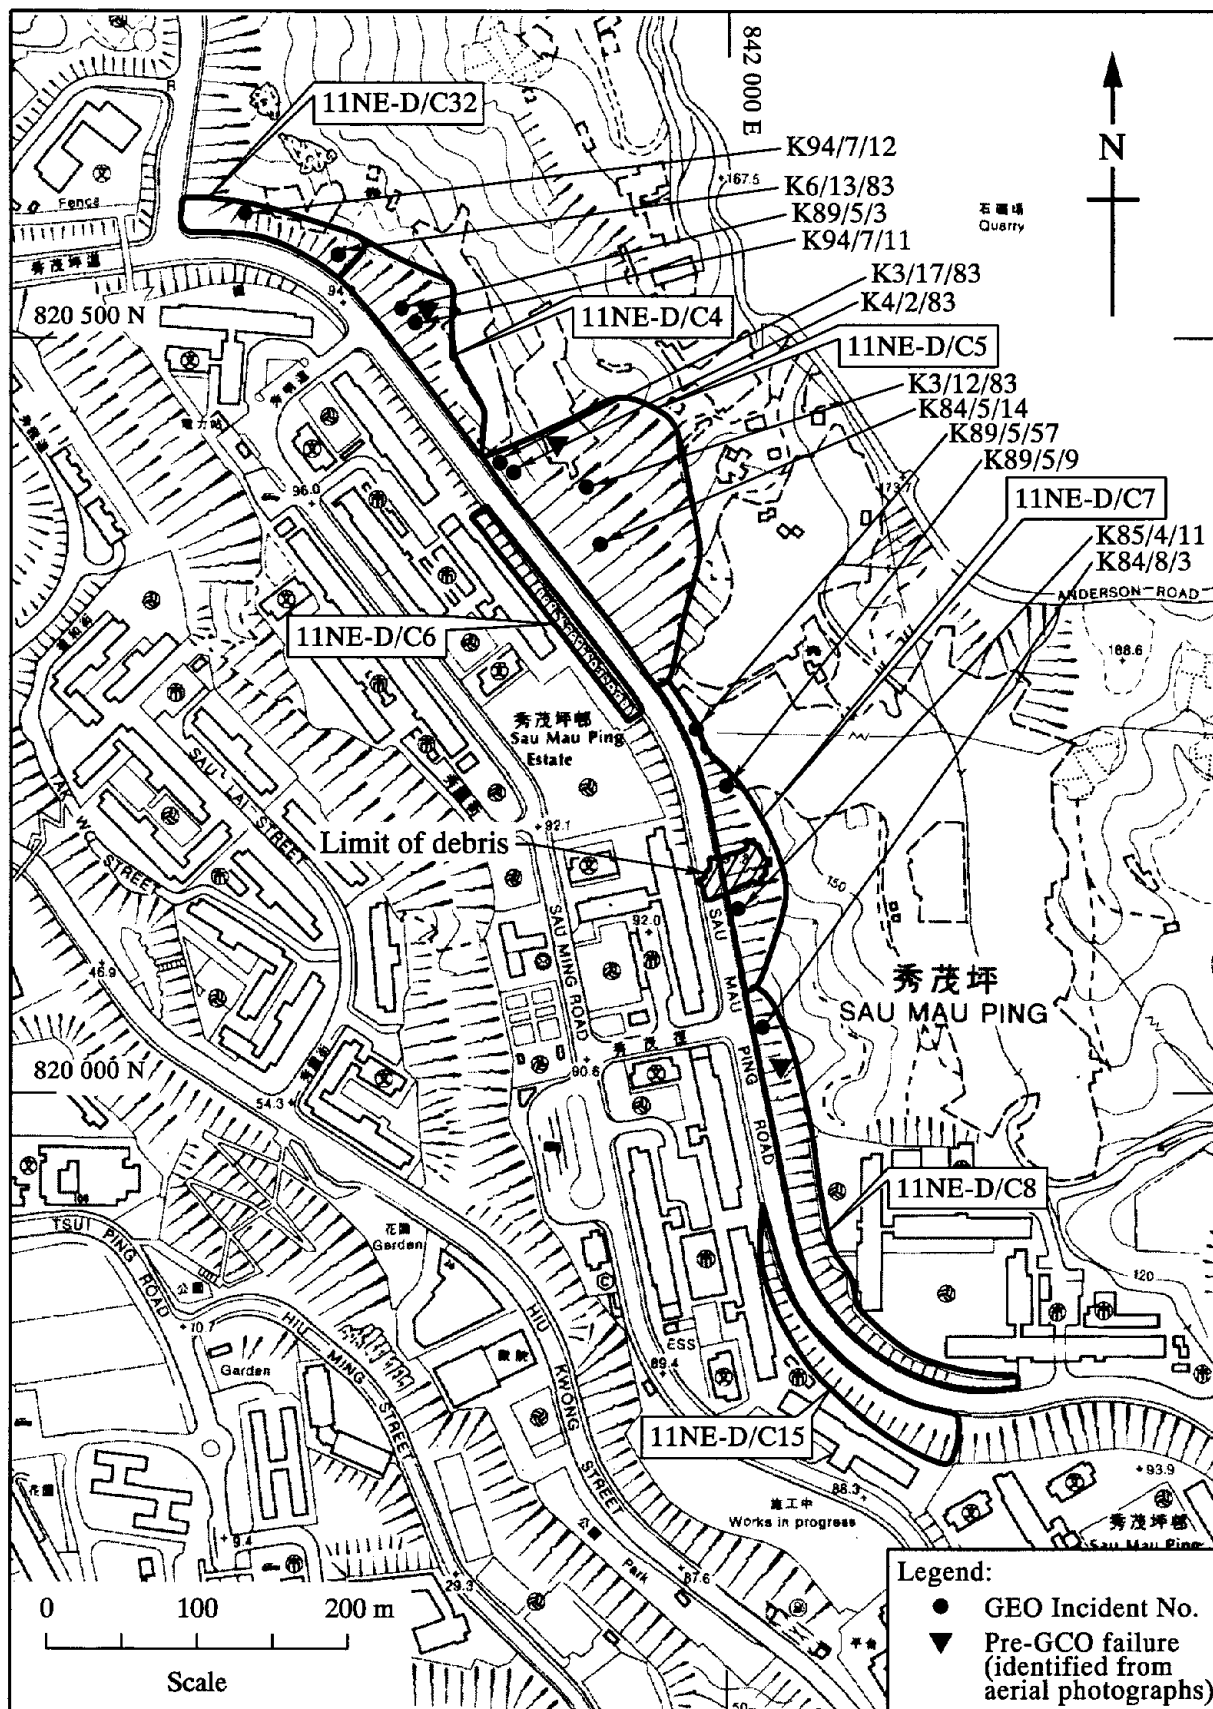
Locations of Previous Failures Involving Cut Slopes along Sau Mau Ping Road
